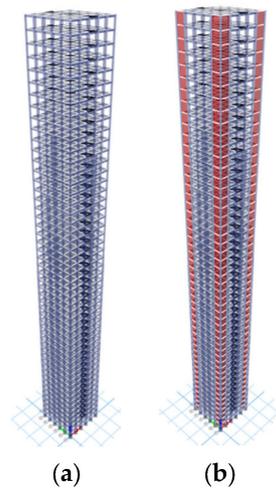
(a) G + 50 Framed Structure 3D Model Case-4; (b) G + 50 shear wall without opening 3D Model Case-5.
